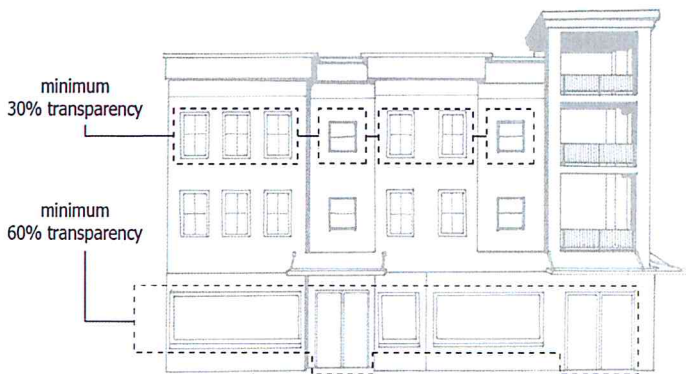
(Façade Elements): All structures within the Union Road Corridor shall provide the minimum level of transparency required by Section 120-69.2, as well the façade requirements of Section 120-70.6 (E) pictured above and outlined at right.
